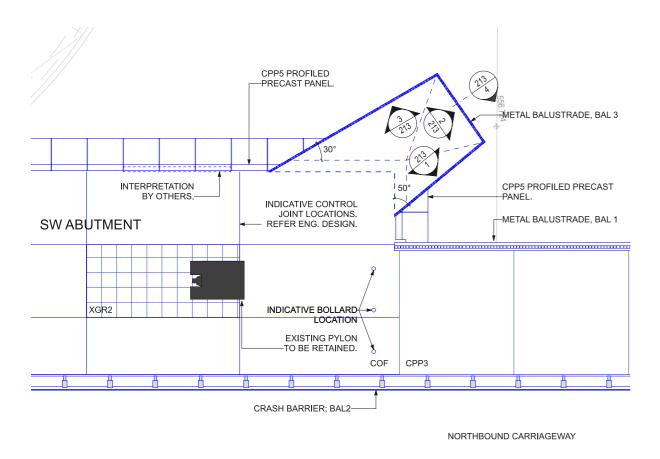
SW Abutment and Lookout Plan (Scale 1:150)
